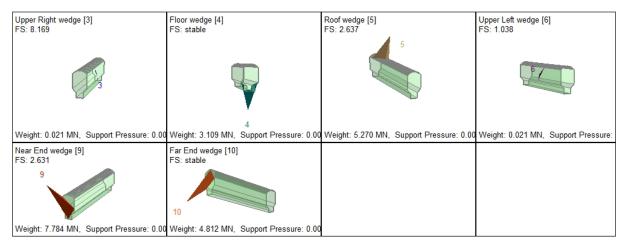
Multi perspective view of wedge failure alternative I (Section B-B)
